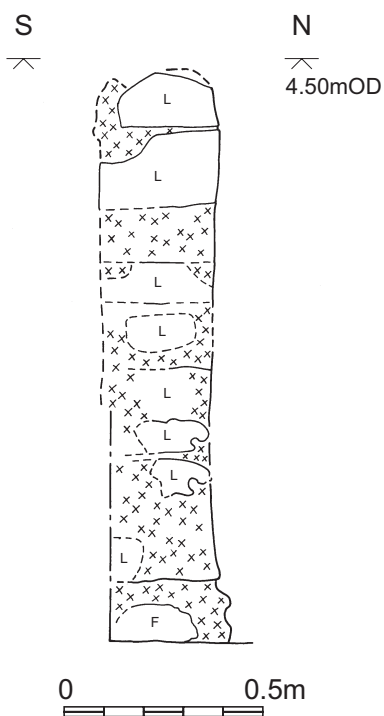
Elevation: pier 2054, showing reused, moulded limestone blocks within the construction. East facing. Scale 1:20
